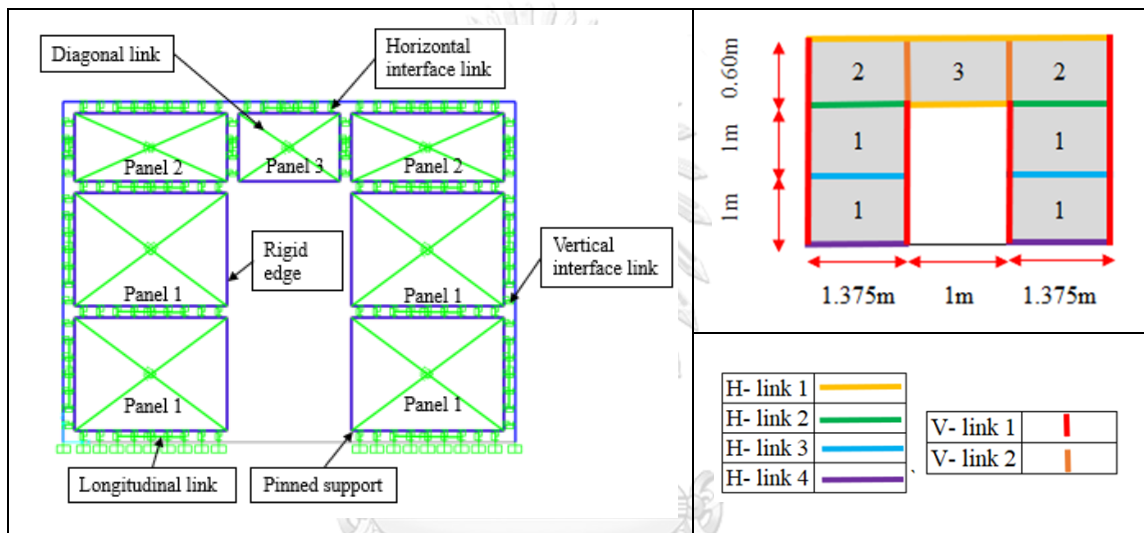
Modeling of masonry infilled frame with door opening Method 2
